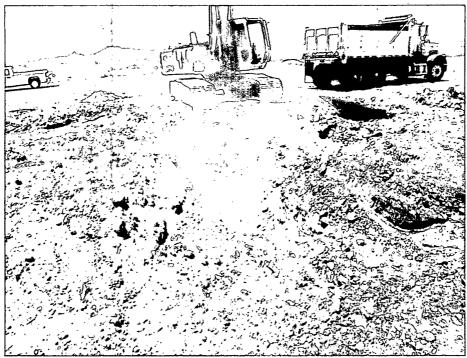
View of excavation to approximately 7 feet bgs in heavily impacted area (looking west).
